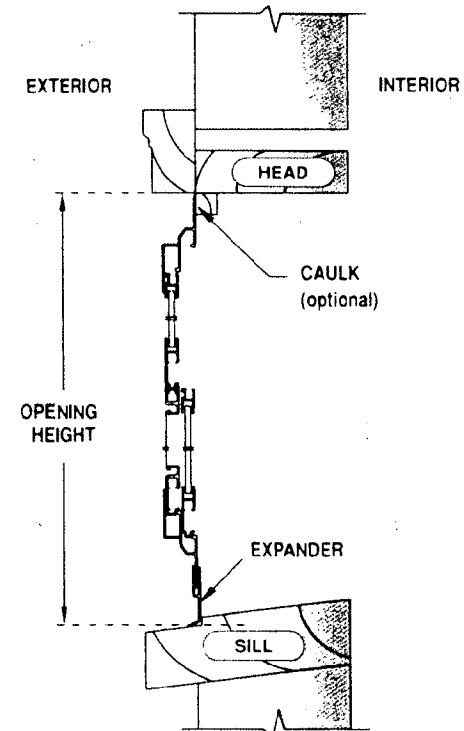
SIDE VIEW VERTICAL SECTION (Model L201 shown)
